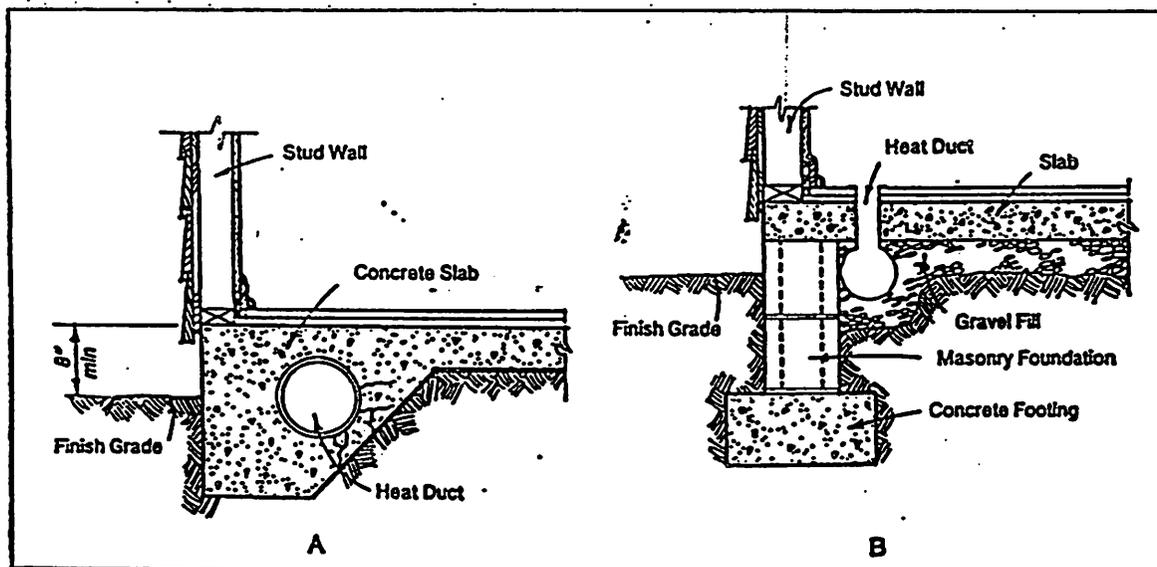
A. Heat duct imbedded in monolithic slab with cracks allowing termite entry. B. Heat duct under supported slab with joint around heat duct which allows termite entry. Adapted from Terminix and NPCA.
